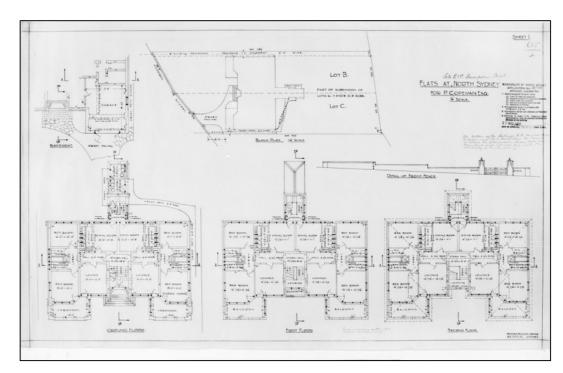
The architectural plans of No. 179 Walker Street for P. Copeland Esq.
